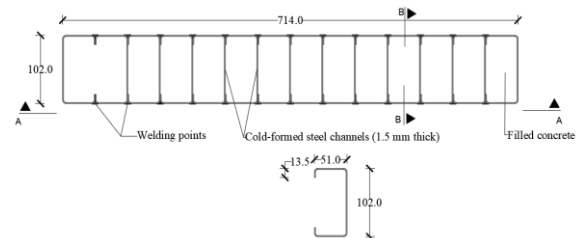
Typical cross-section of specimens and details of cold-formed channel section (units in mm)
